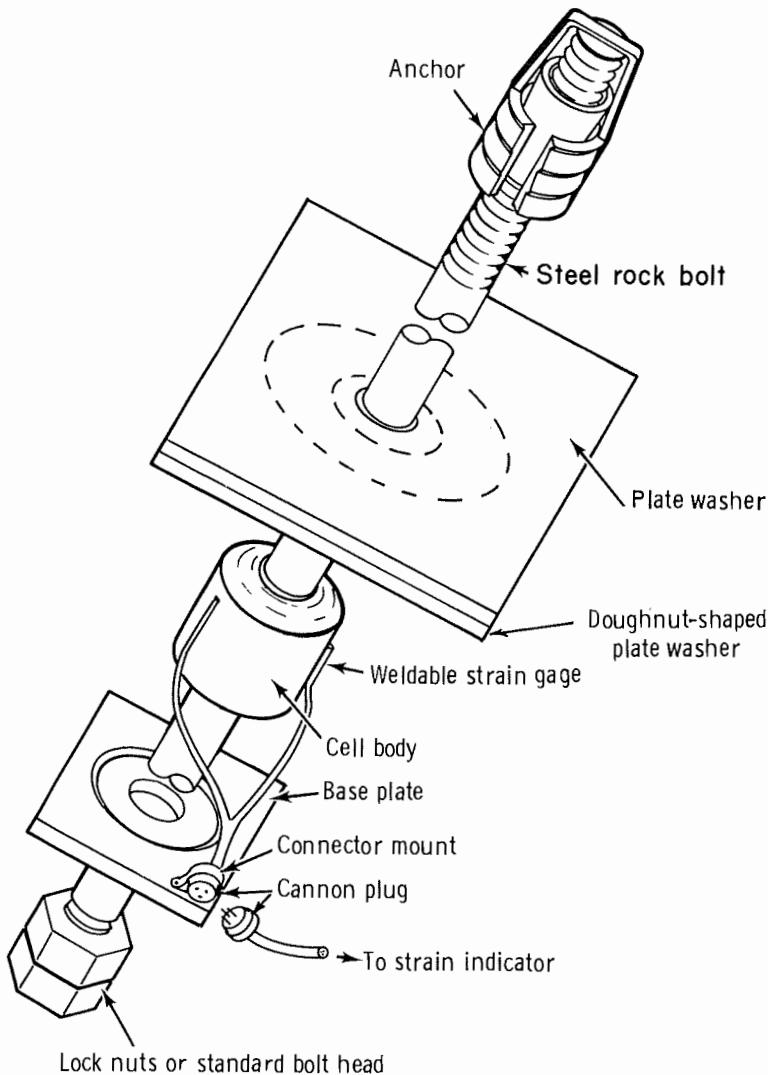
Cutaway view of rock-bolt load cell installed on a bolt.
